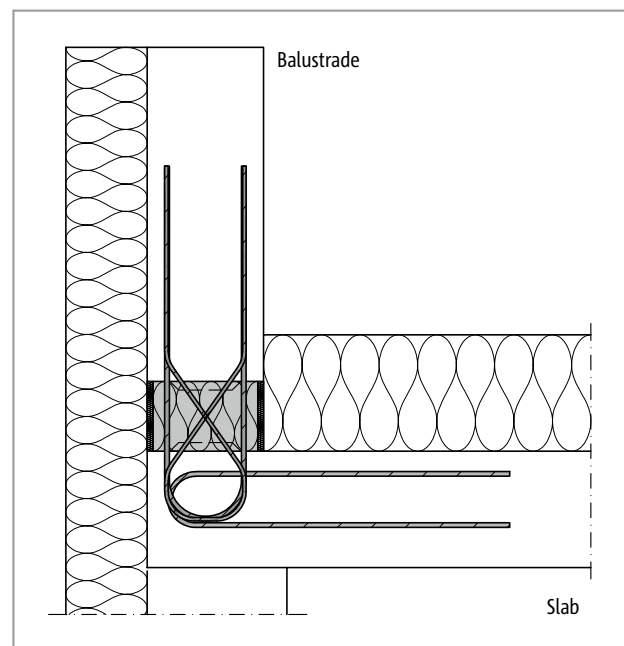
Schöck Isokorb® XT type A: Connection to a balustrade (XT type A-MM2)
